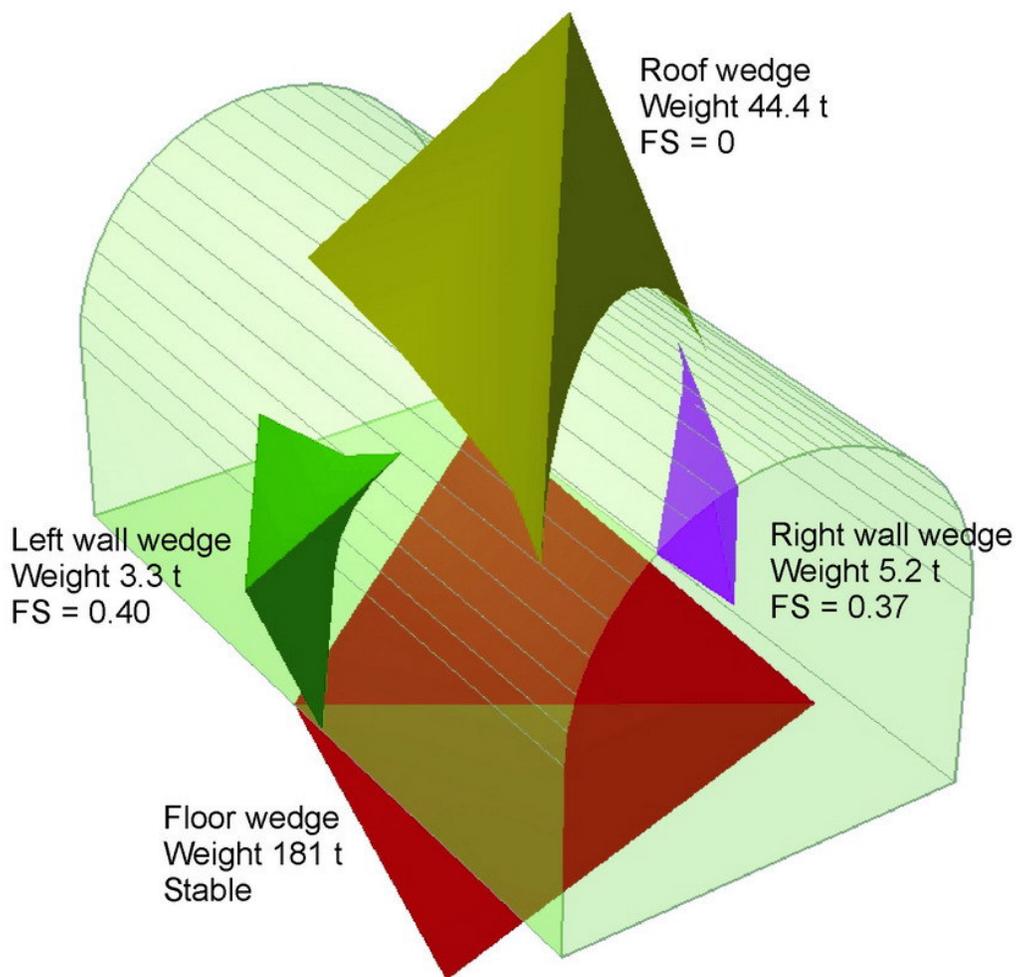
Wedges formed in the roof, floor and sidewalls of a ramp excavated in a jointed rock mass, in which the average dip and dip direction of three dominant structural features are defined by the great circles plotted in Figure 1.
